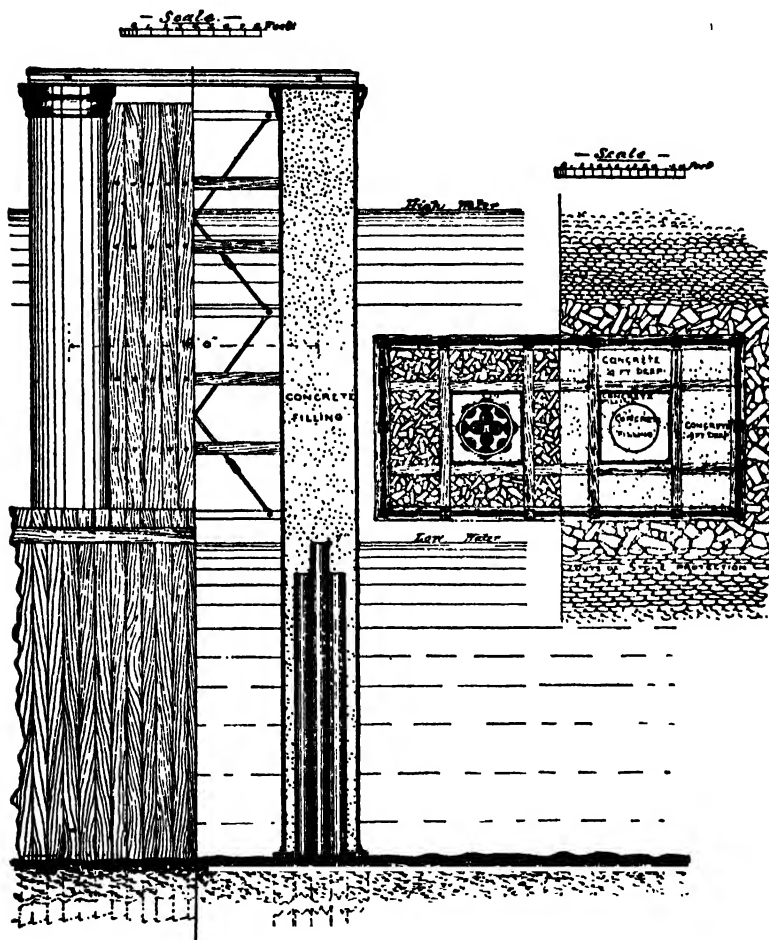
Cylinder Piers of Victoria Bridge over Bear River, Nova Scotia.
